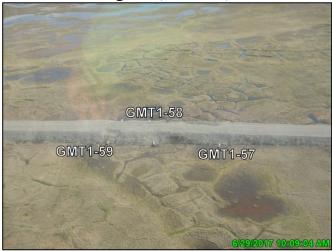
GMT1 culverts 57, 58, and 59, looking southeast; June 29, 2017
